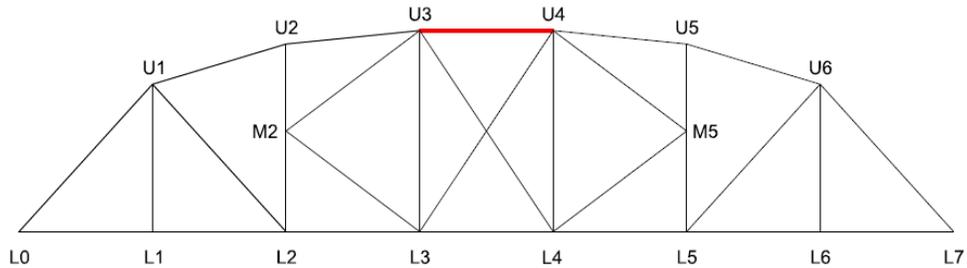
Overstressed Truss Members (Span 2) – Rehabilitation with Widening
